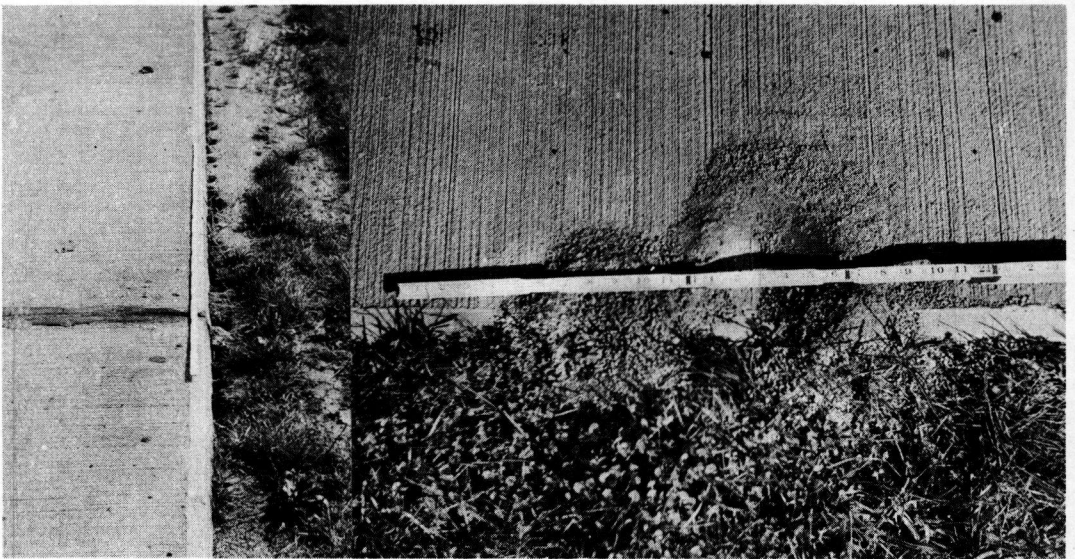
Extrusion of material at edge of pavement slab in 3-inch soil-cement subbase section (type II pumping). Pavement is reinforced concrete with joint spacing of 40 feet. Right is Station 360+67; on the left is Station 358+67.
